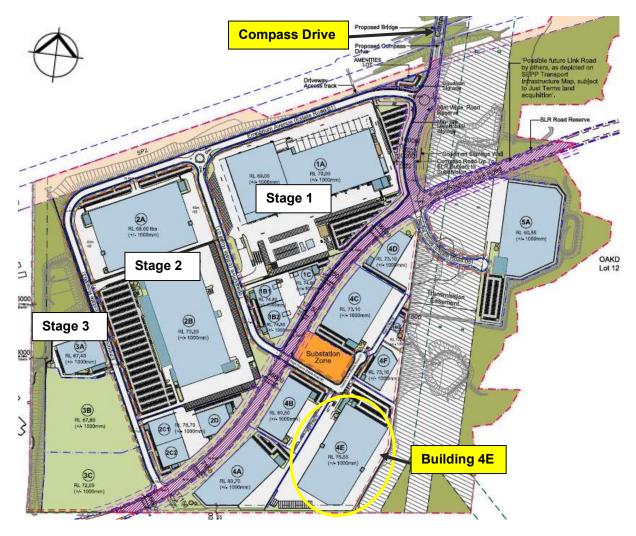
| Approved Concept Plan Layout & Location of Building 4E
